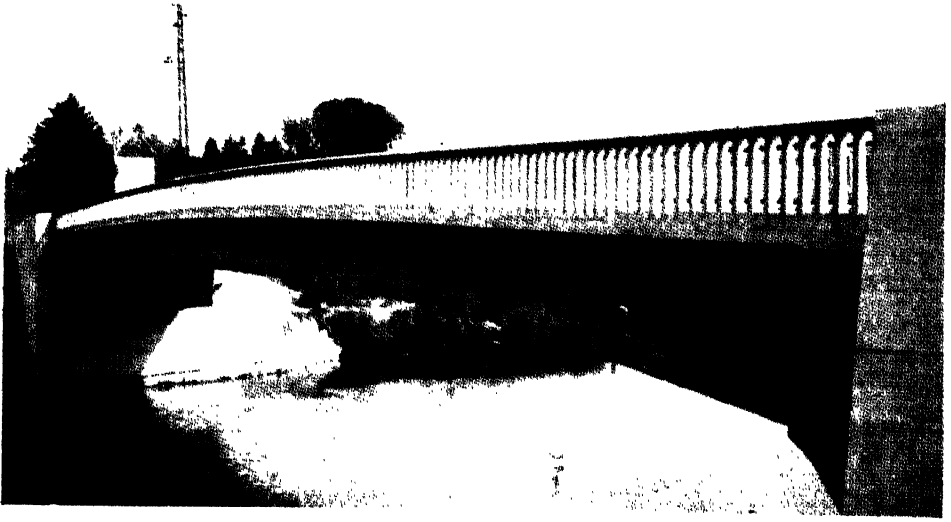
PRESTRESSED CONCRETE BRIDGE OVER THE RIVER MARNE AT LUZANCY.
